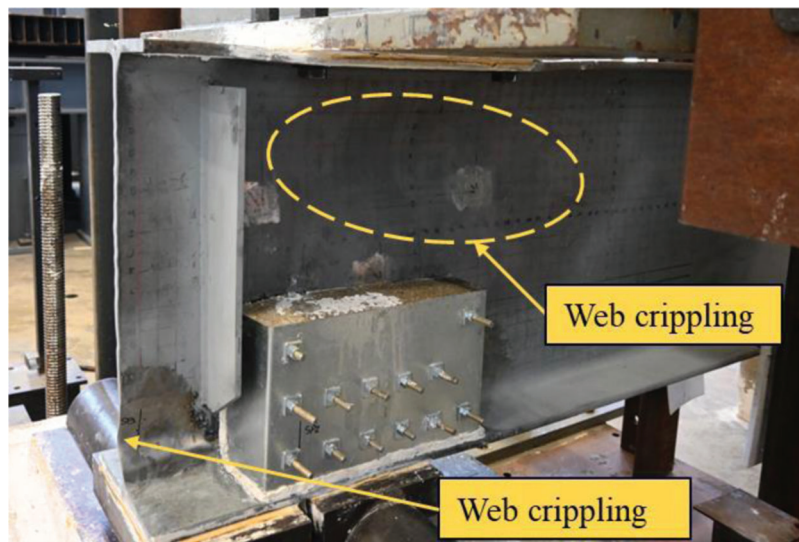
Specimen 5: deformed shape, view from the west side.
